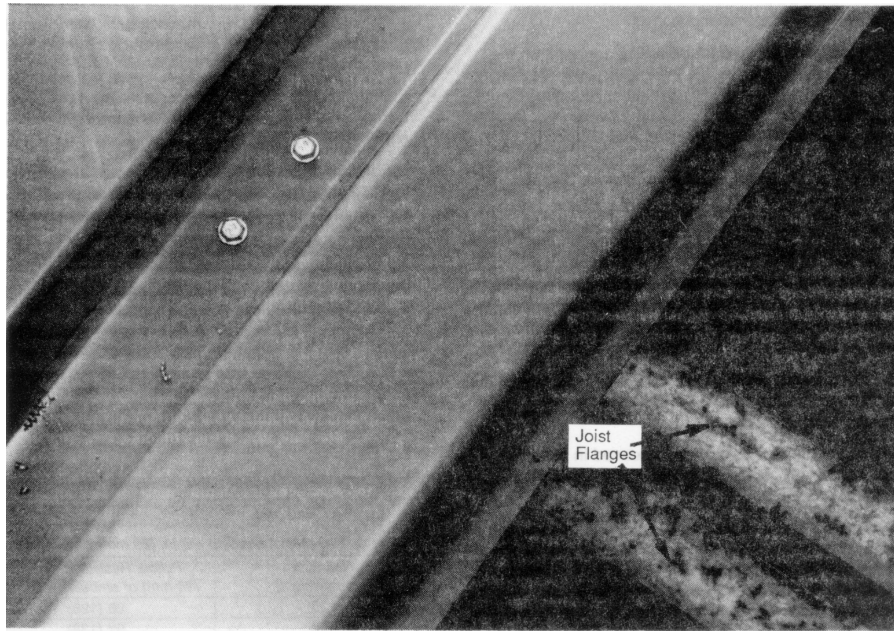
Use of multiple deck fasteners in one steel deck rib
